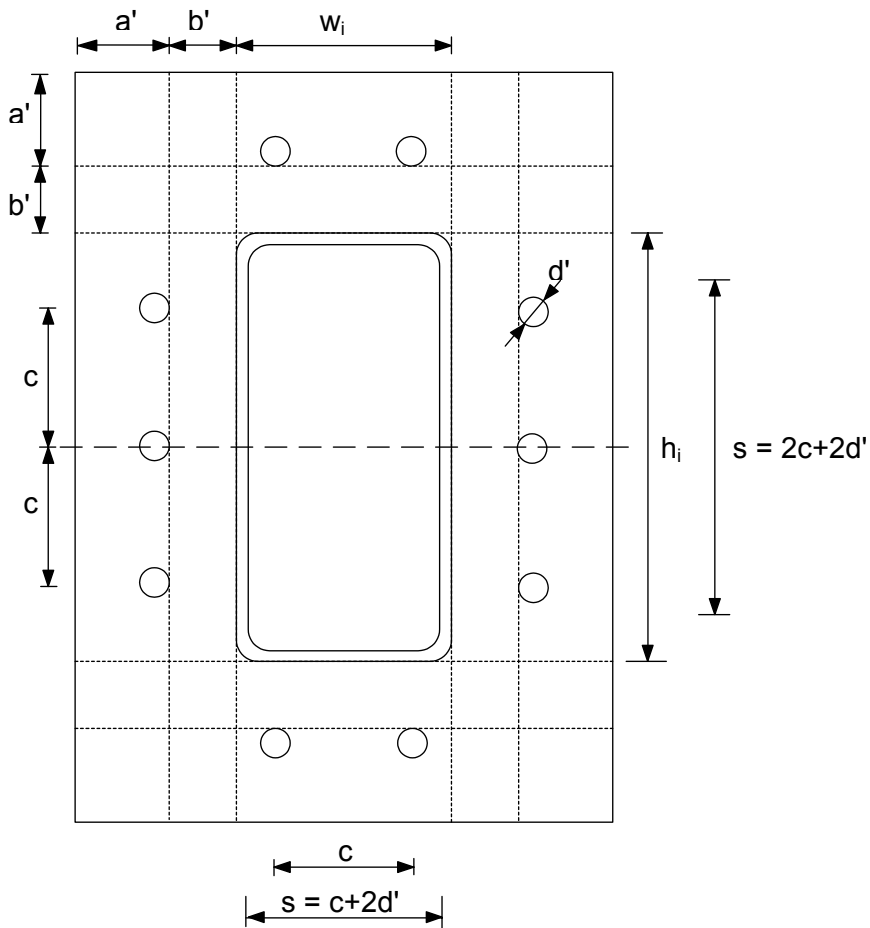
Definition of tributary flange-plate width p for flange-plate connections with bolts on all four sides of the connection
